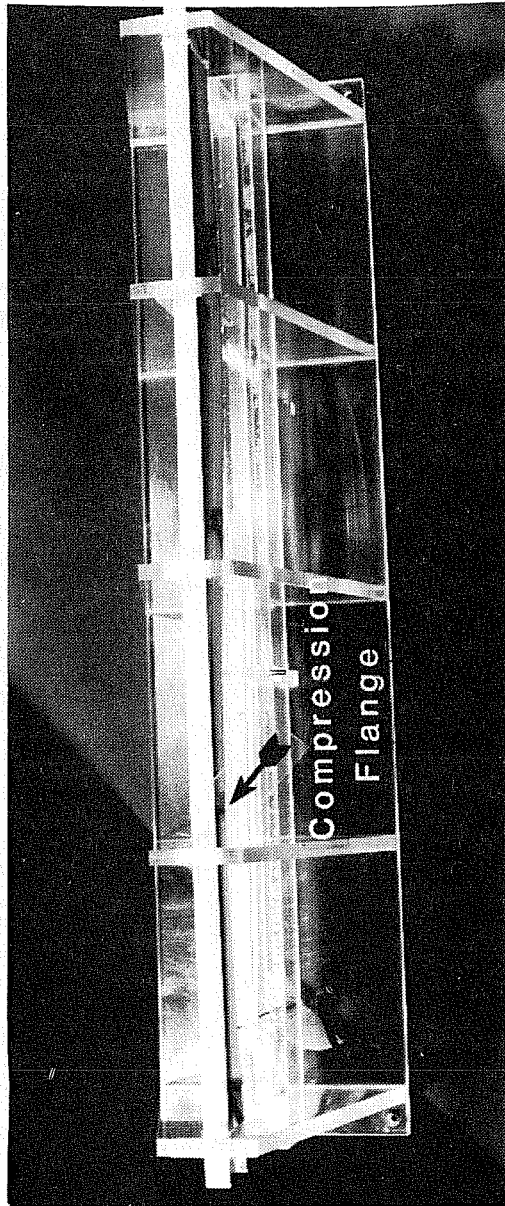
Plan view of buckled plexiglass model beam showing lateral-torsional buckling
